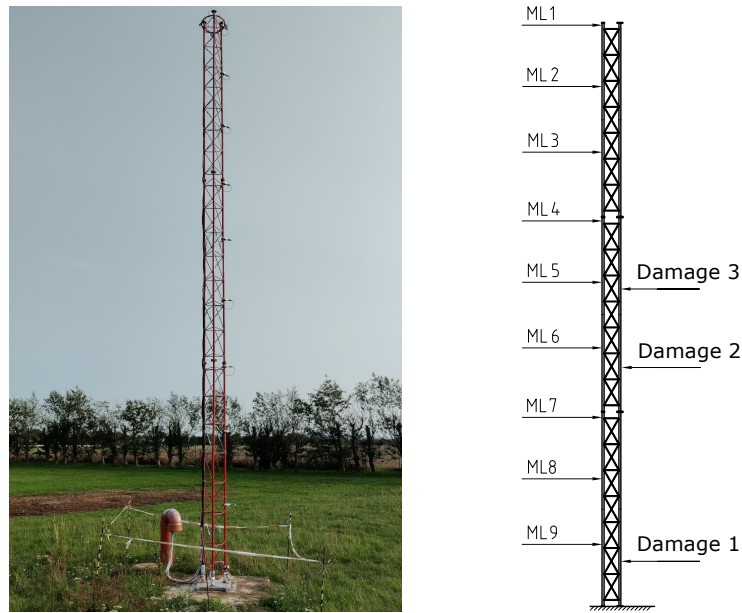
Girder mast structure: Photograph (left) and sketch with damage position (right).
